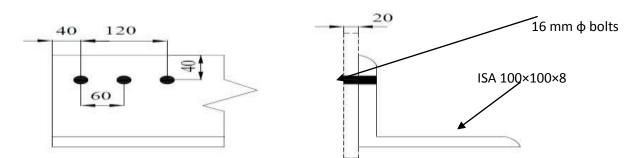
Design Details of diagonal member (All dimensions are in mm).
